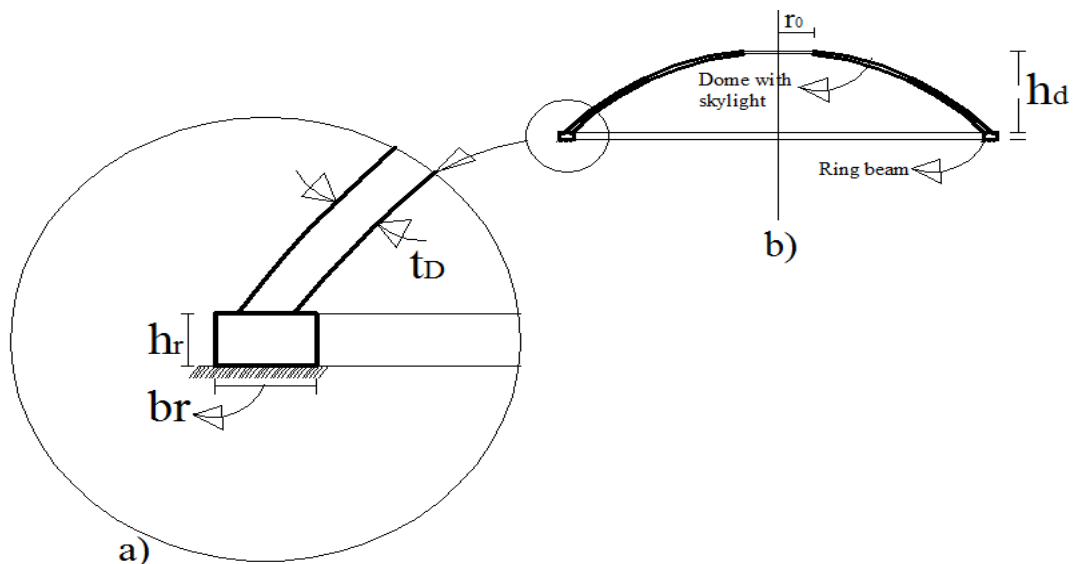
Section view of elevation of the spherical dome a) Junction detail b) section elevation view.
